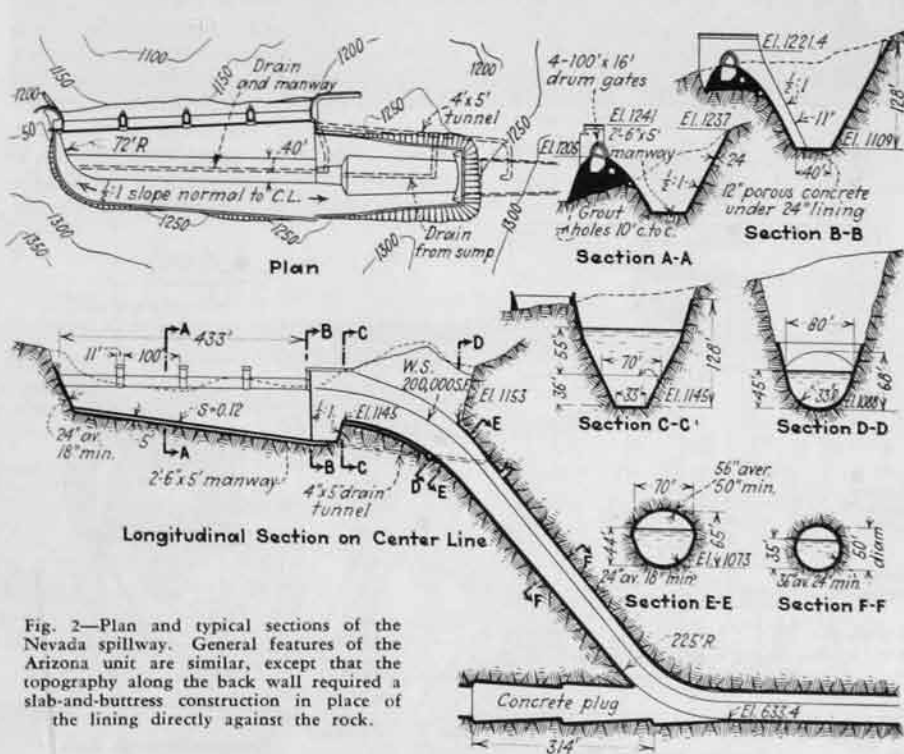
Plan and typical sections of the Nevada spillway. General features of the Arizona unit are similar, except that the topography along the back wall required a slab-and-buttress construction in place of the lining directly against the rock.
